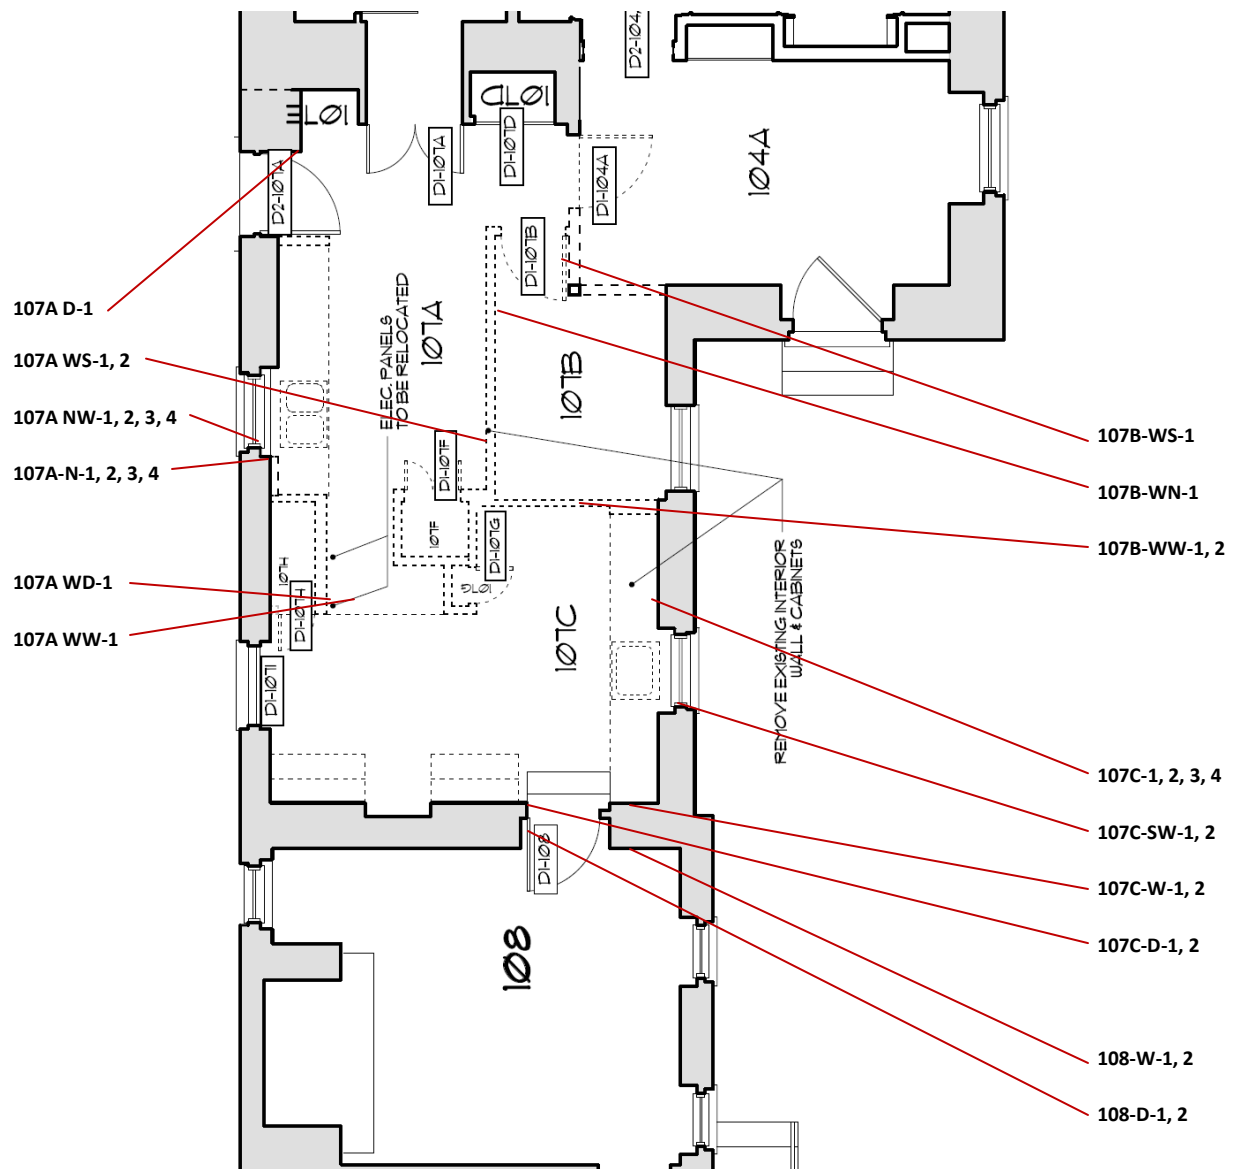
Sample area notations on first floor plans drawn by Glenn Keyes Architects.
